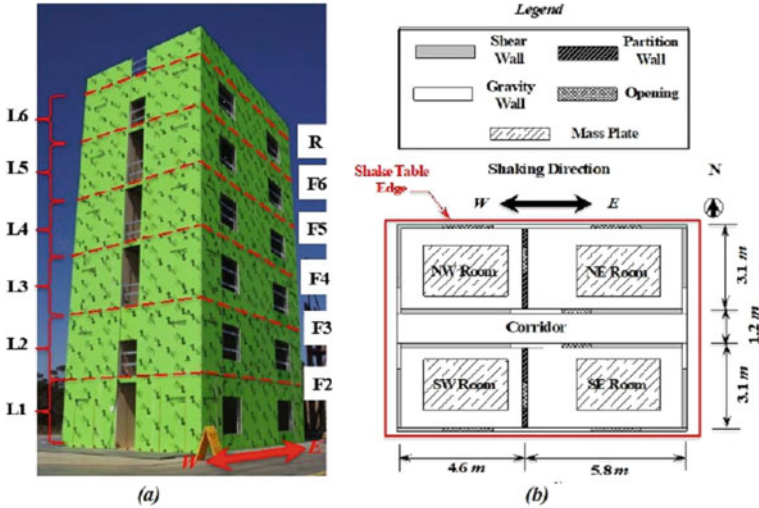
a Isometric view of test building, b building plan layout (typical of floors 2 to 6) [32]
